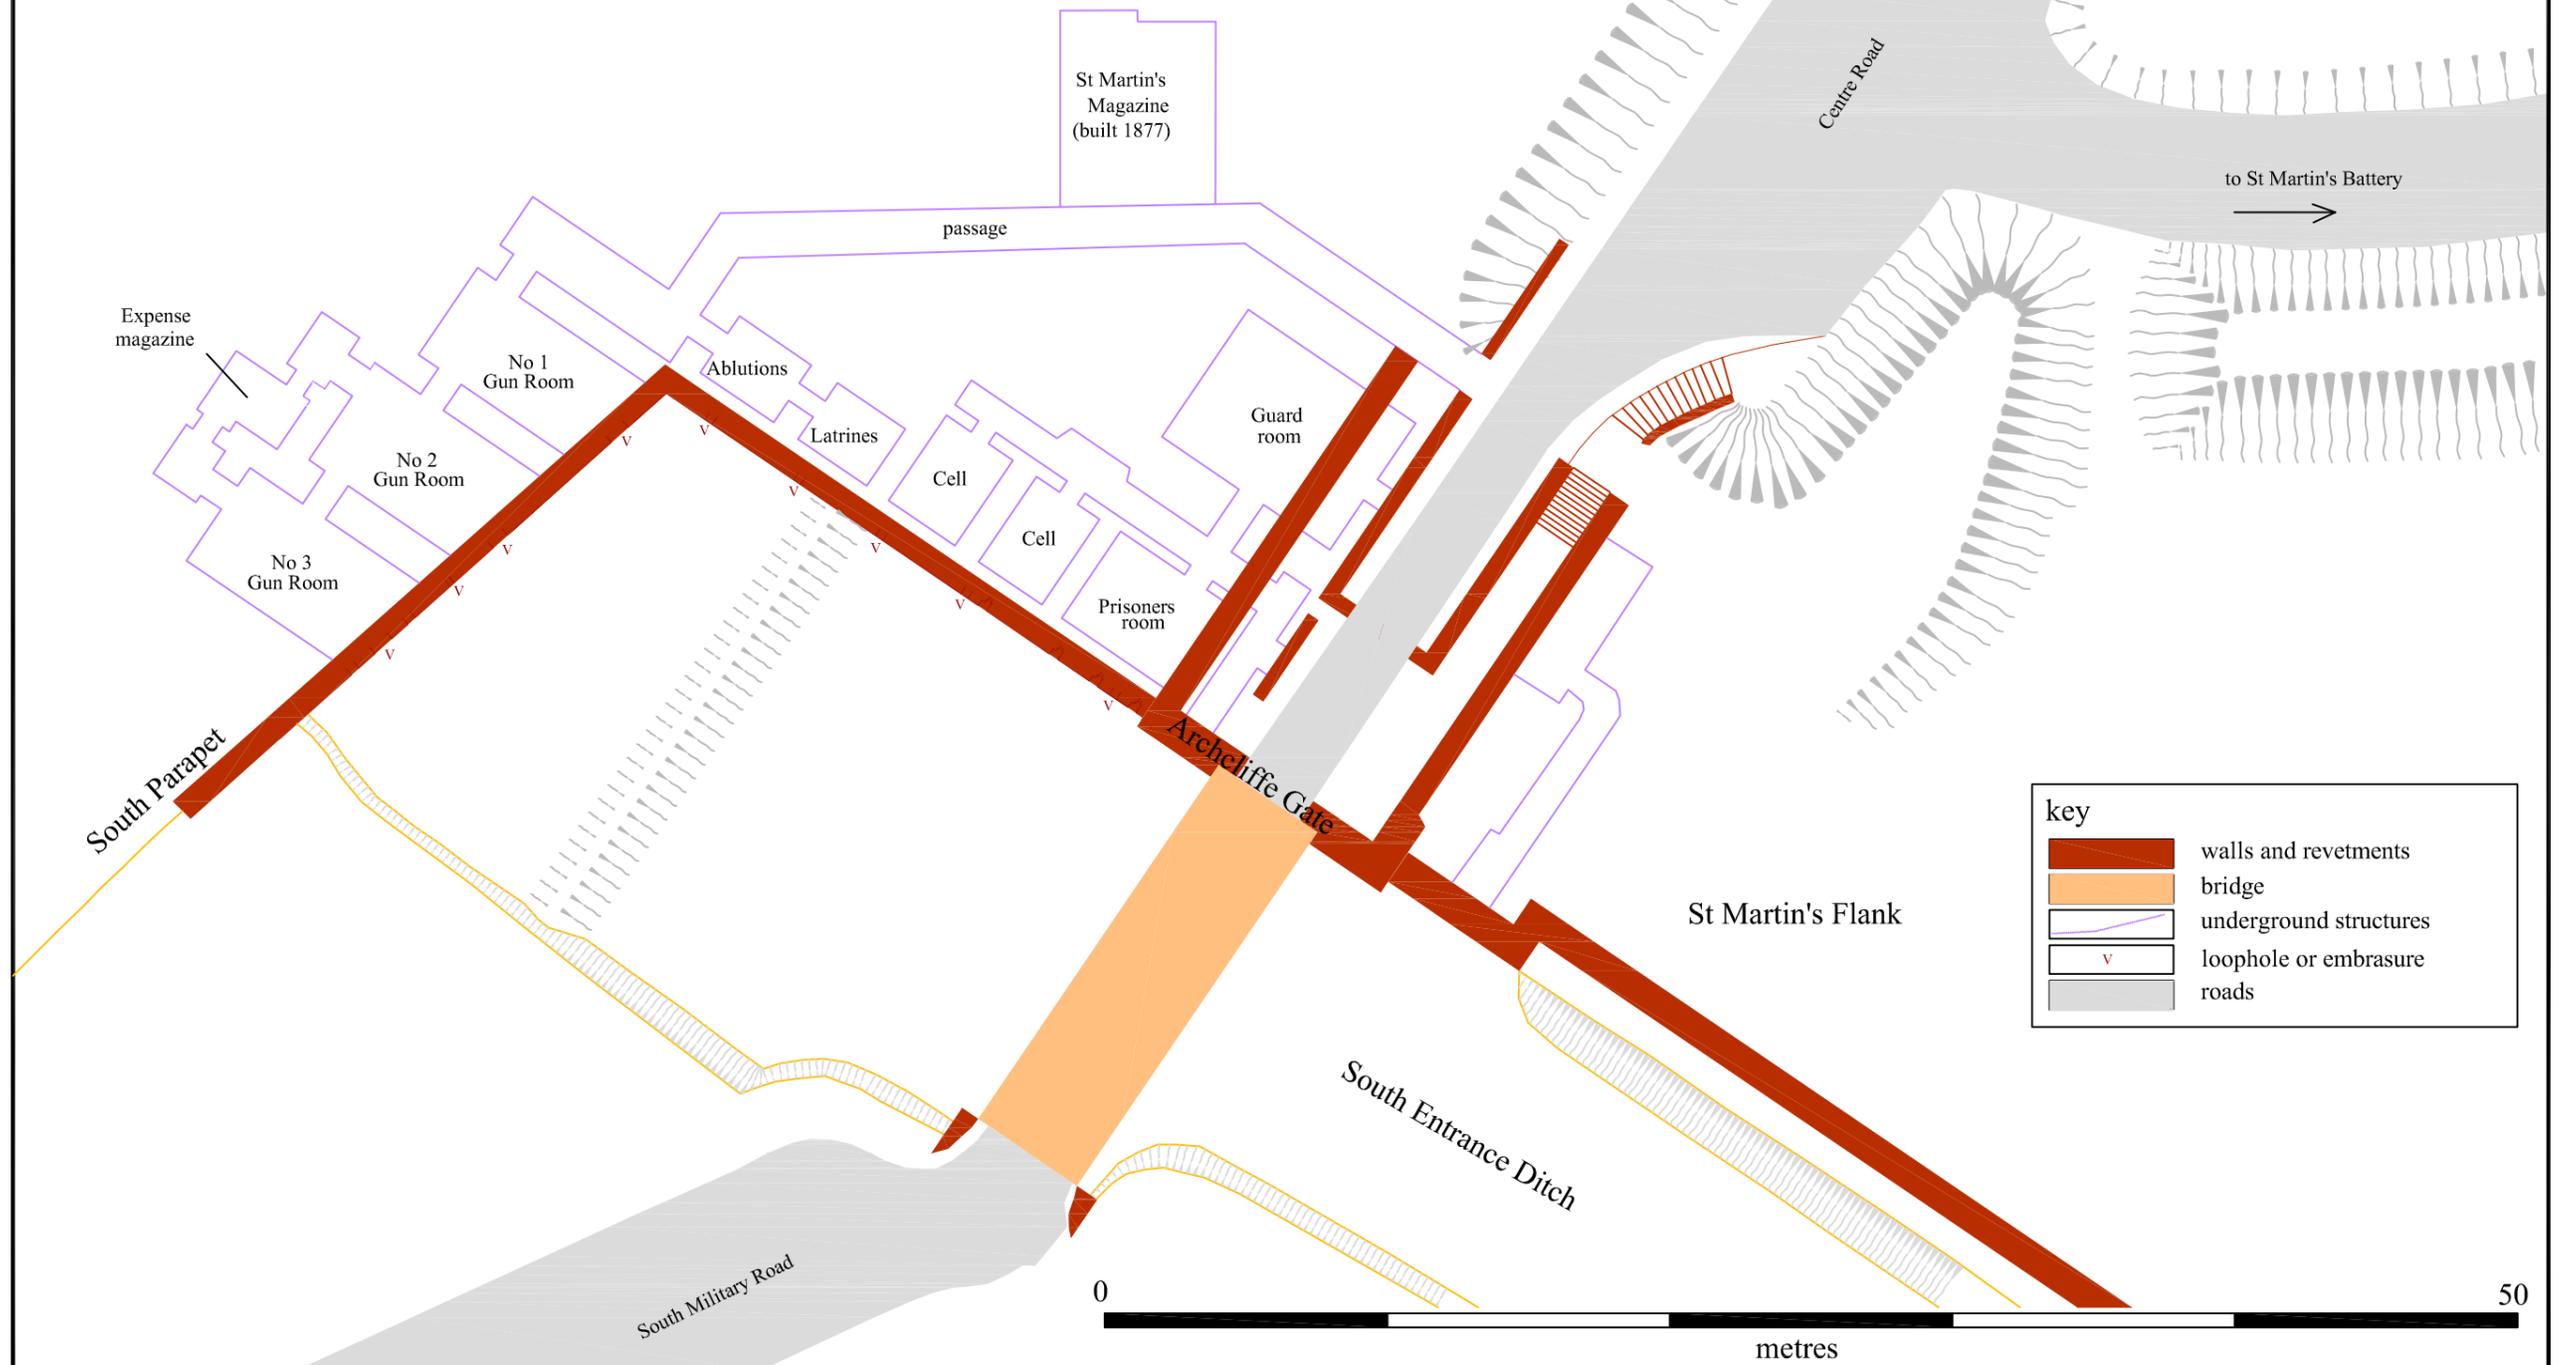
A plan of the South Entrance, based upon a plan dated 1876
